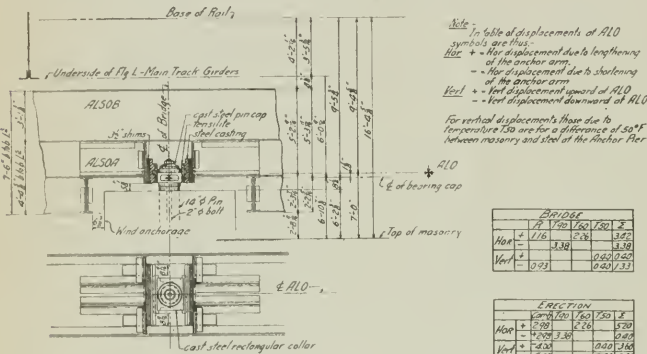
Expansion Joint for Bottom Lateral System at End of Anchor Arm, Providing for Both Vertical and Horizontal Motion
